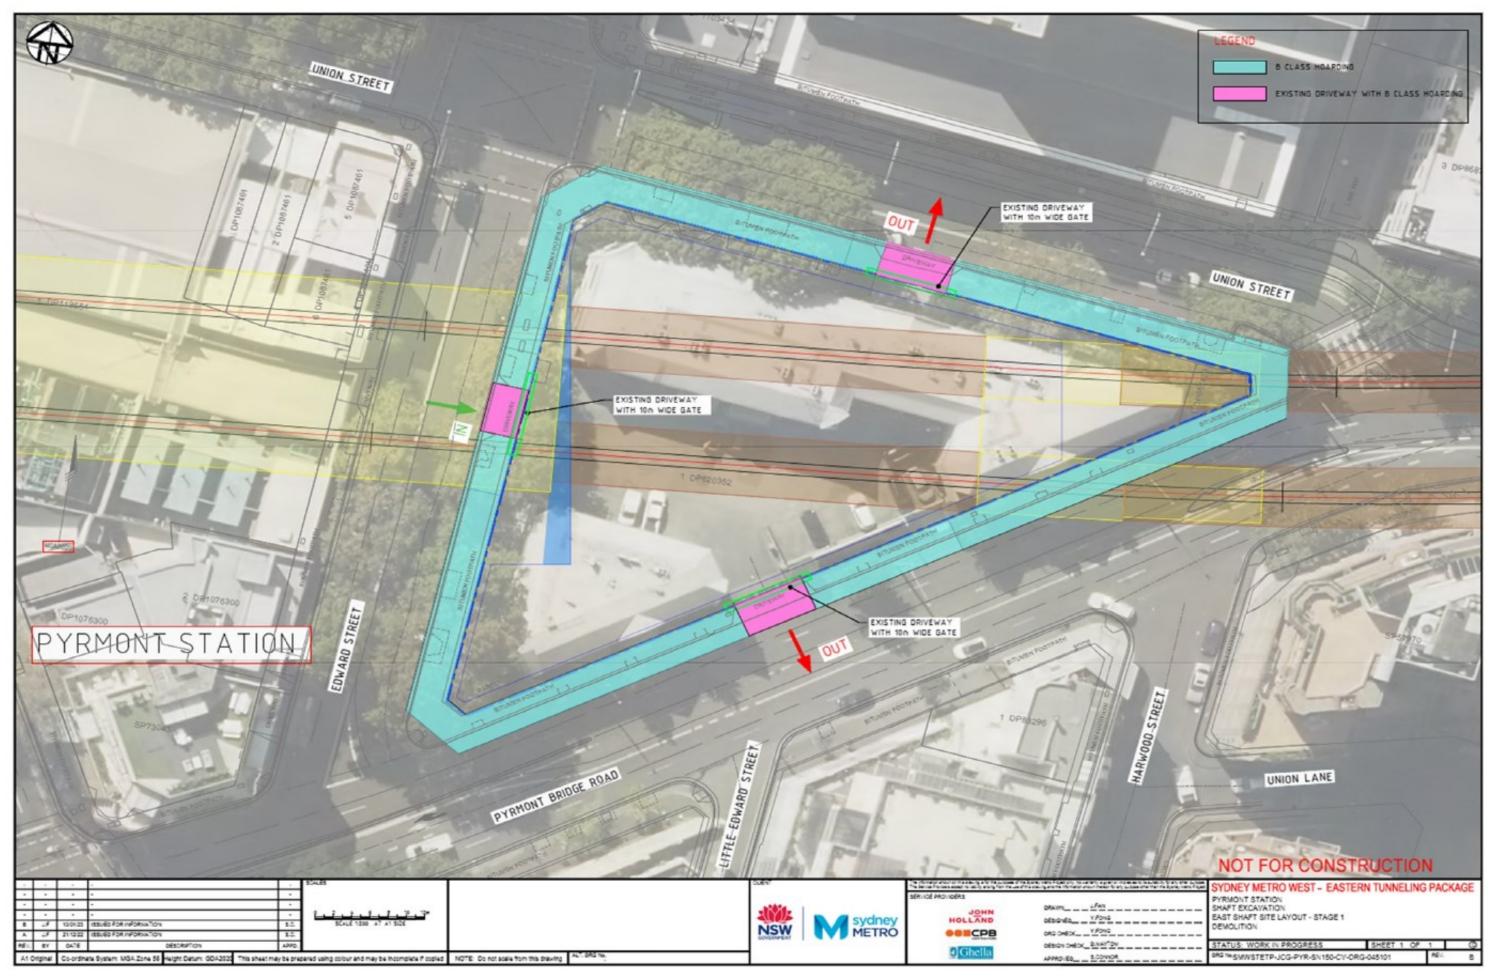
Site Layout and Hoardings (Stage 2)
